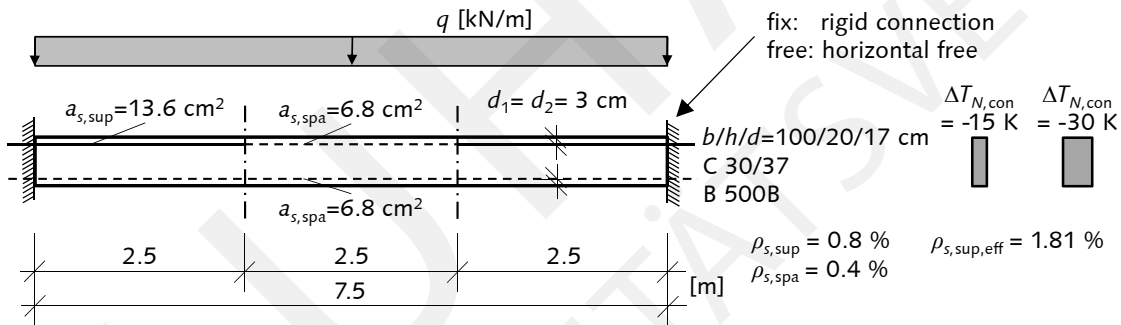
Concrete slab in office building due to external load and temperature restraint, based on [85, 267]
